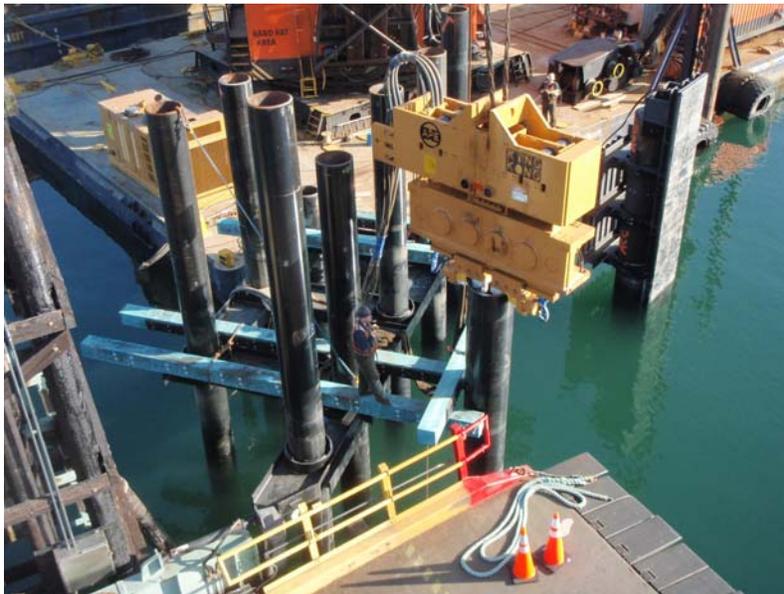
Vibratory Hammer Driving a Steel Pile
